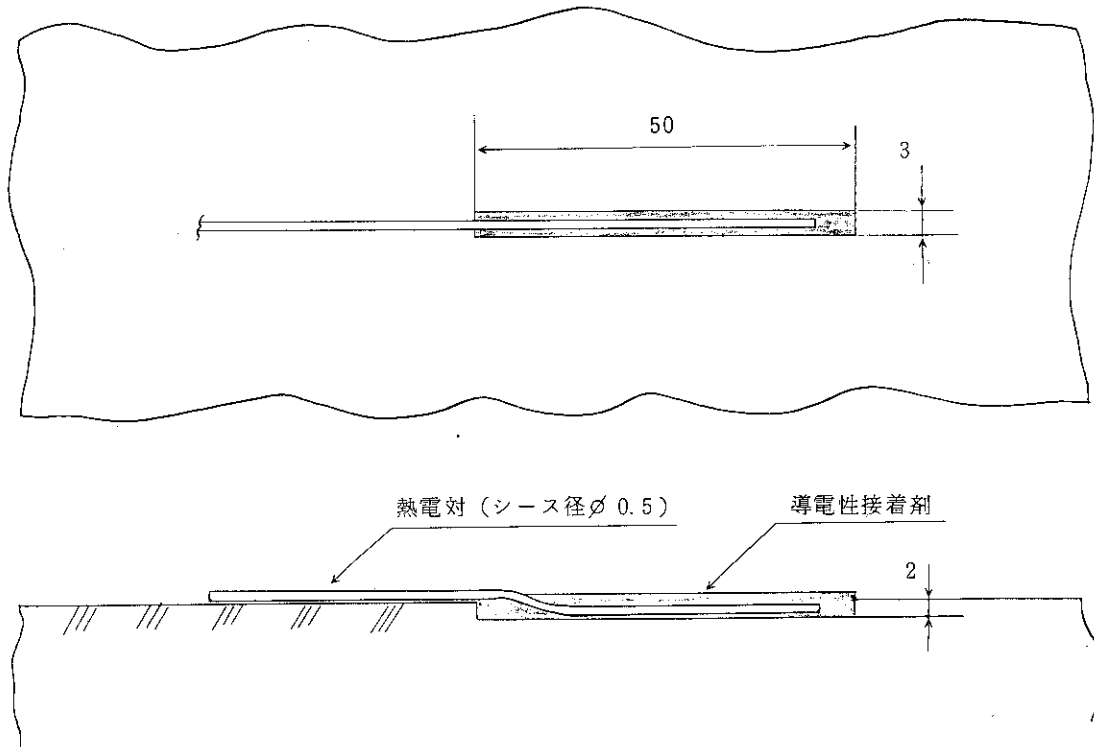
Schematic of installation of thermocouples on drywell floor, wall, and ceiling
